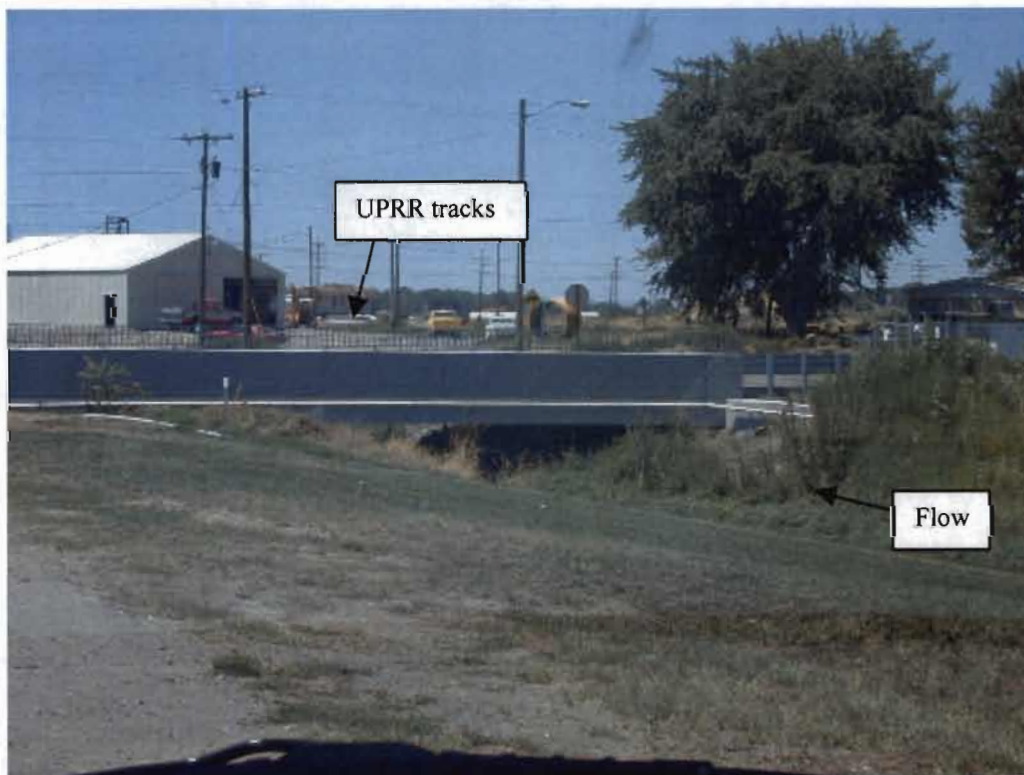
View looks downstream (northwest) at upstream face of bridge
